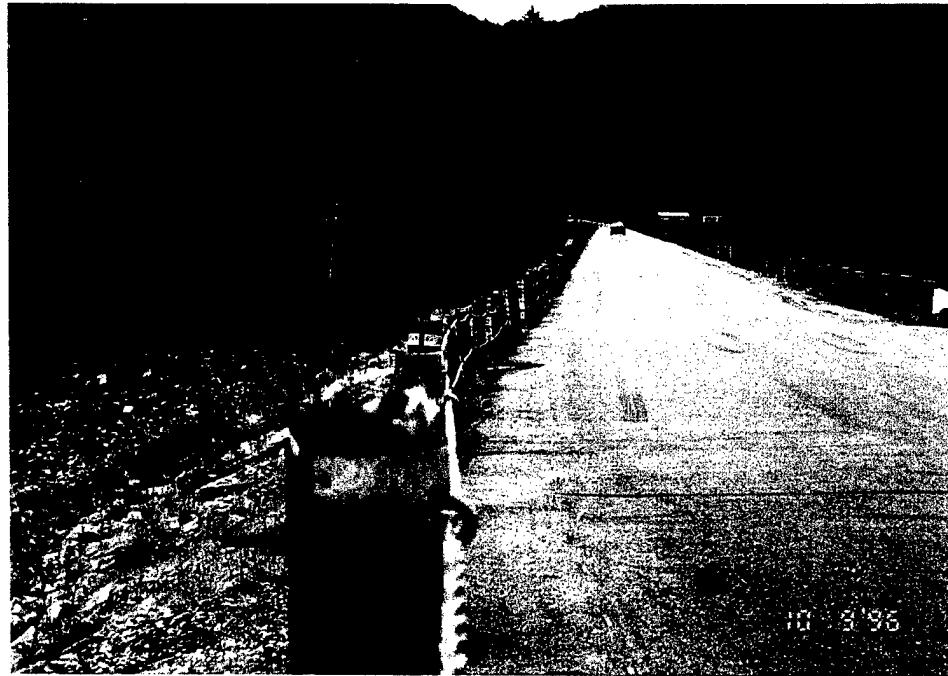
Crest of dam, looking towards right abutment. Note posts moved out of alignment by snow plows.
